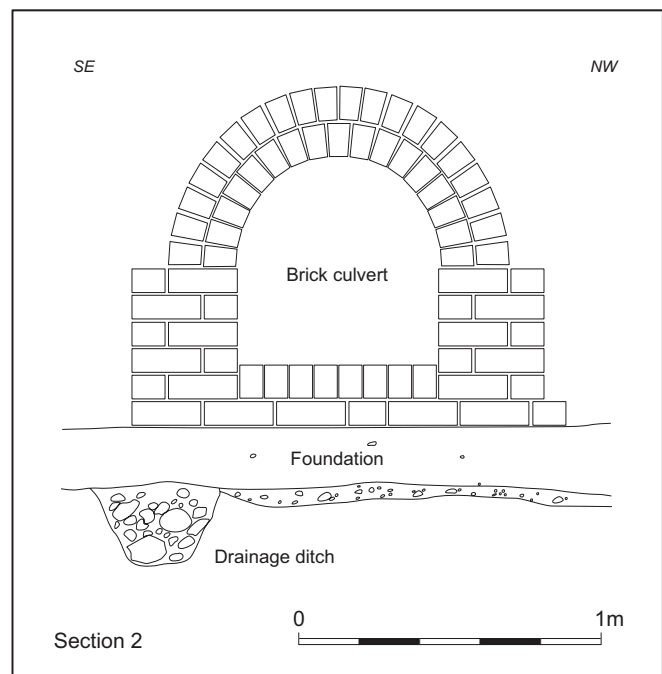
Section through the brick drain between the canal basin and the sluice chamber
